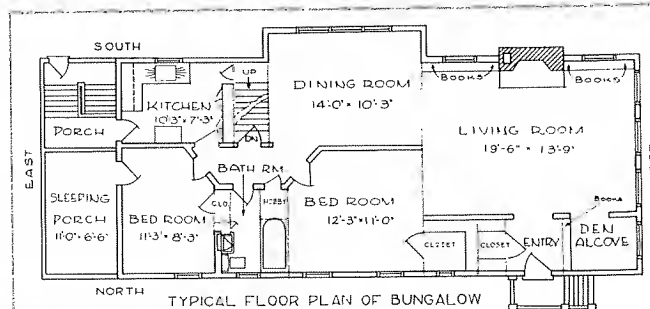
Floor Plan of 5-Room Bungalow as Revised with Solid Metal Lath Partitions (red).
